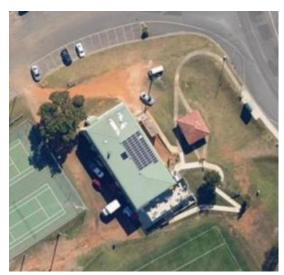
Aerial of clubhouse showing new building extension to the south and access ramp
